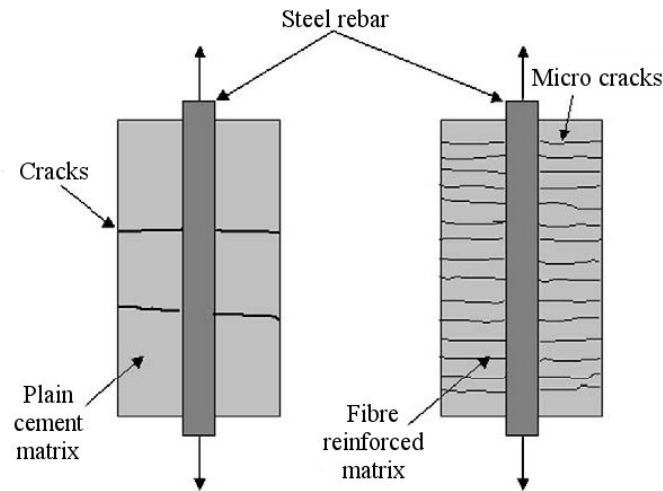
Crack pattern in reinforced concrete and fiber reinforced concrete (*FRC*) elements subjected to tension [30].
